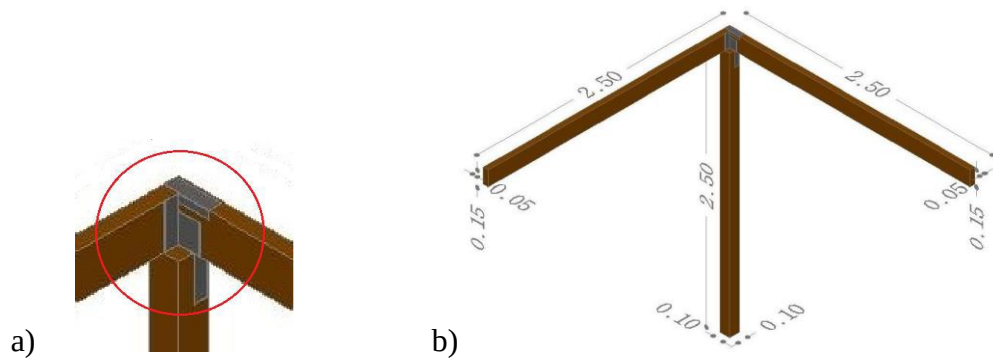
, b: a) timber construction connector detail b) connection detail of column to beam
